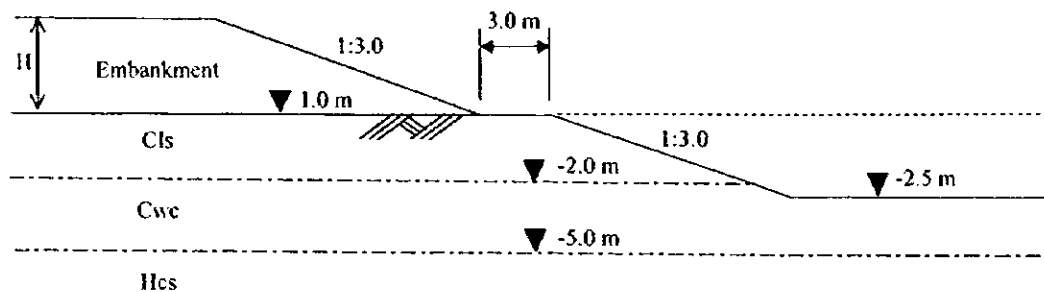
Cross Section for Bank Stability Analysis with Countermeasures
